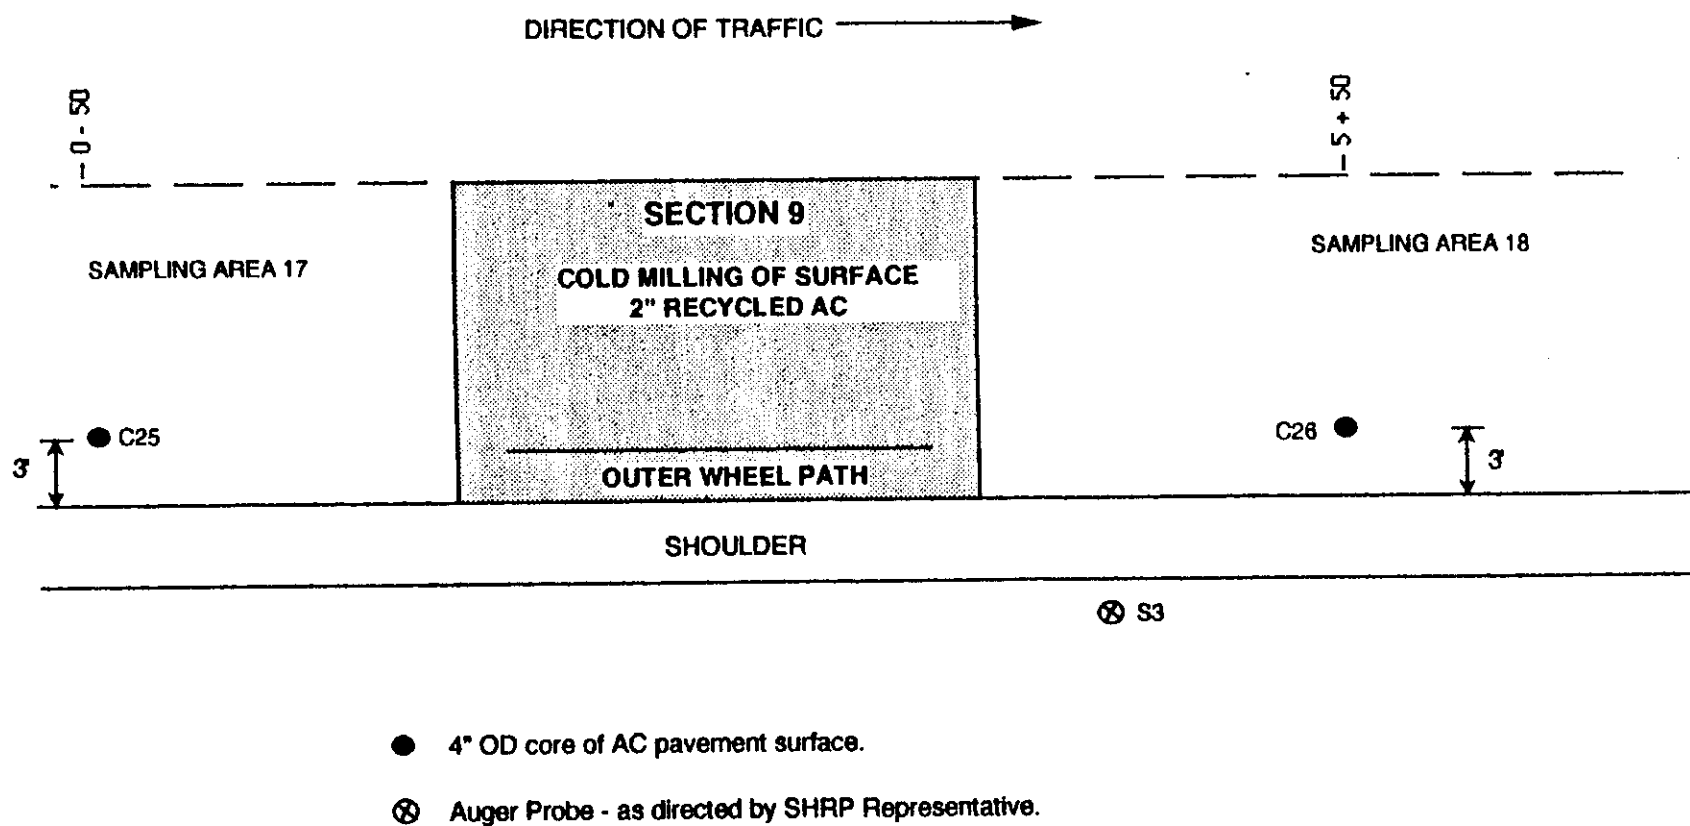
Example of "Pre-Construction" Sampling Plan for Section 9.
